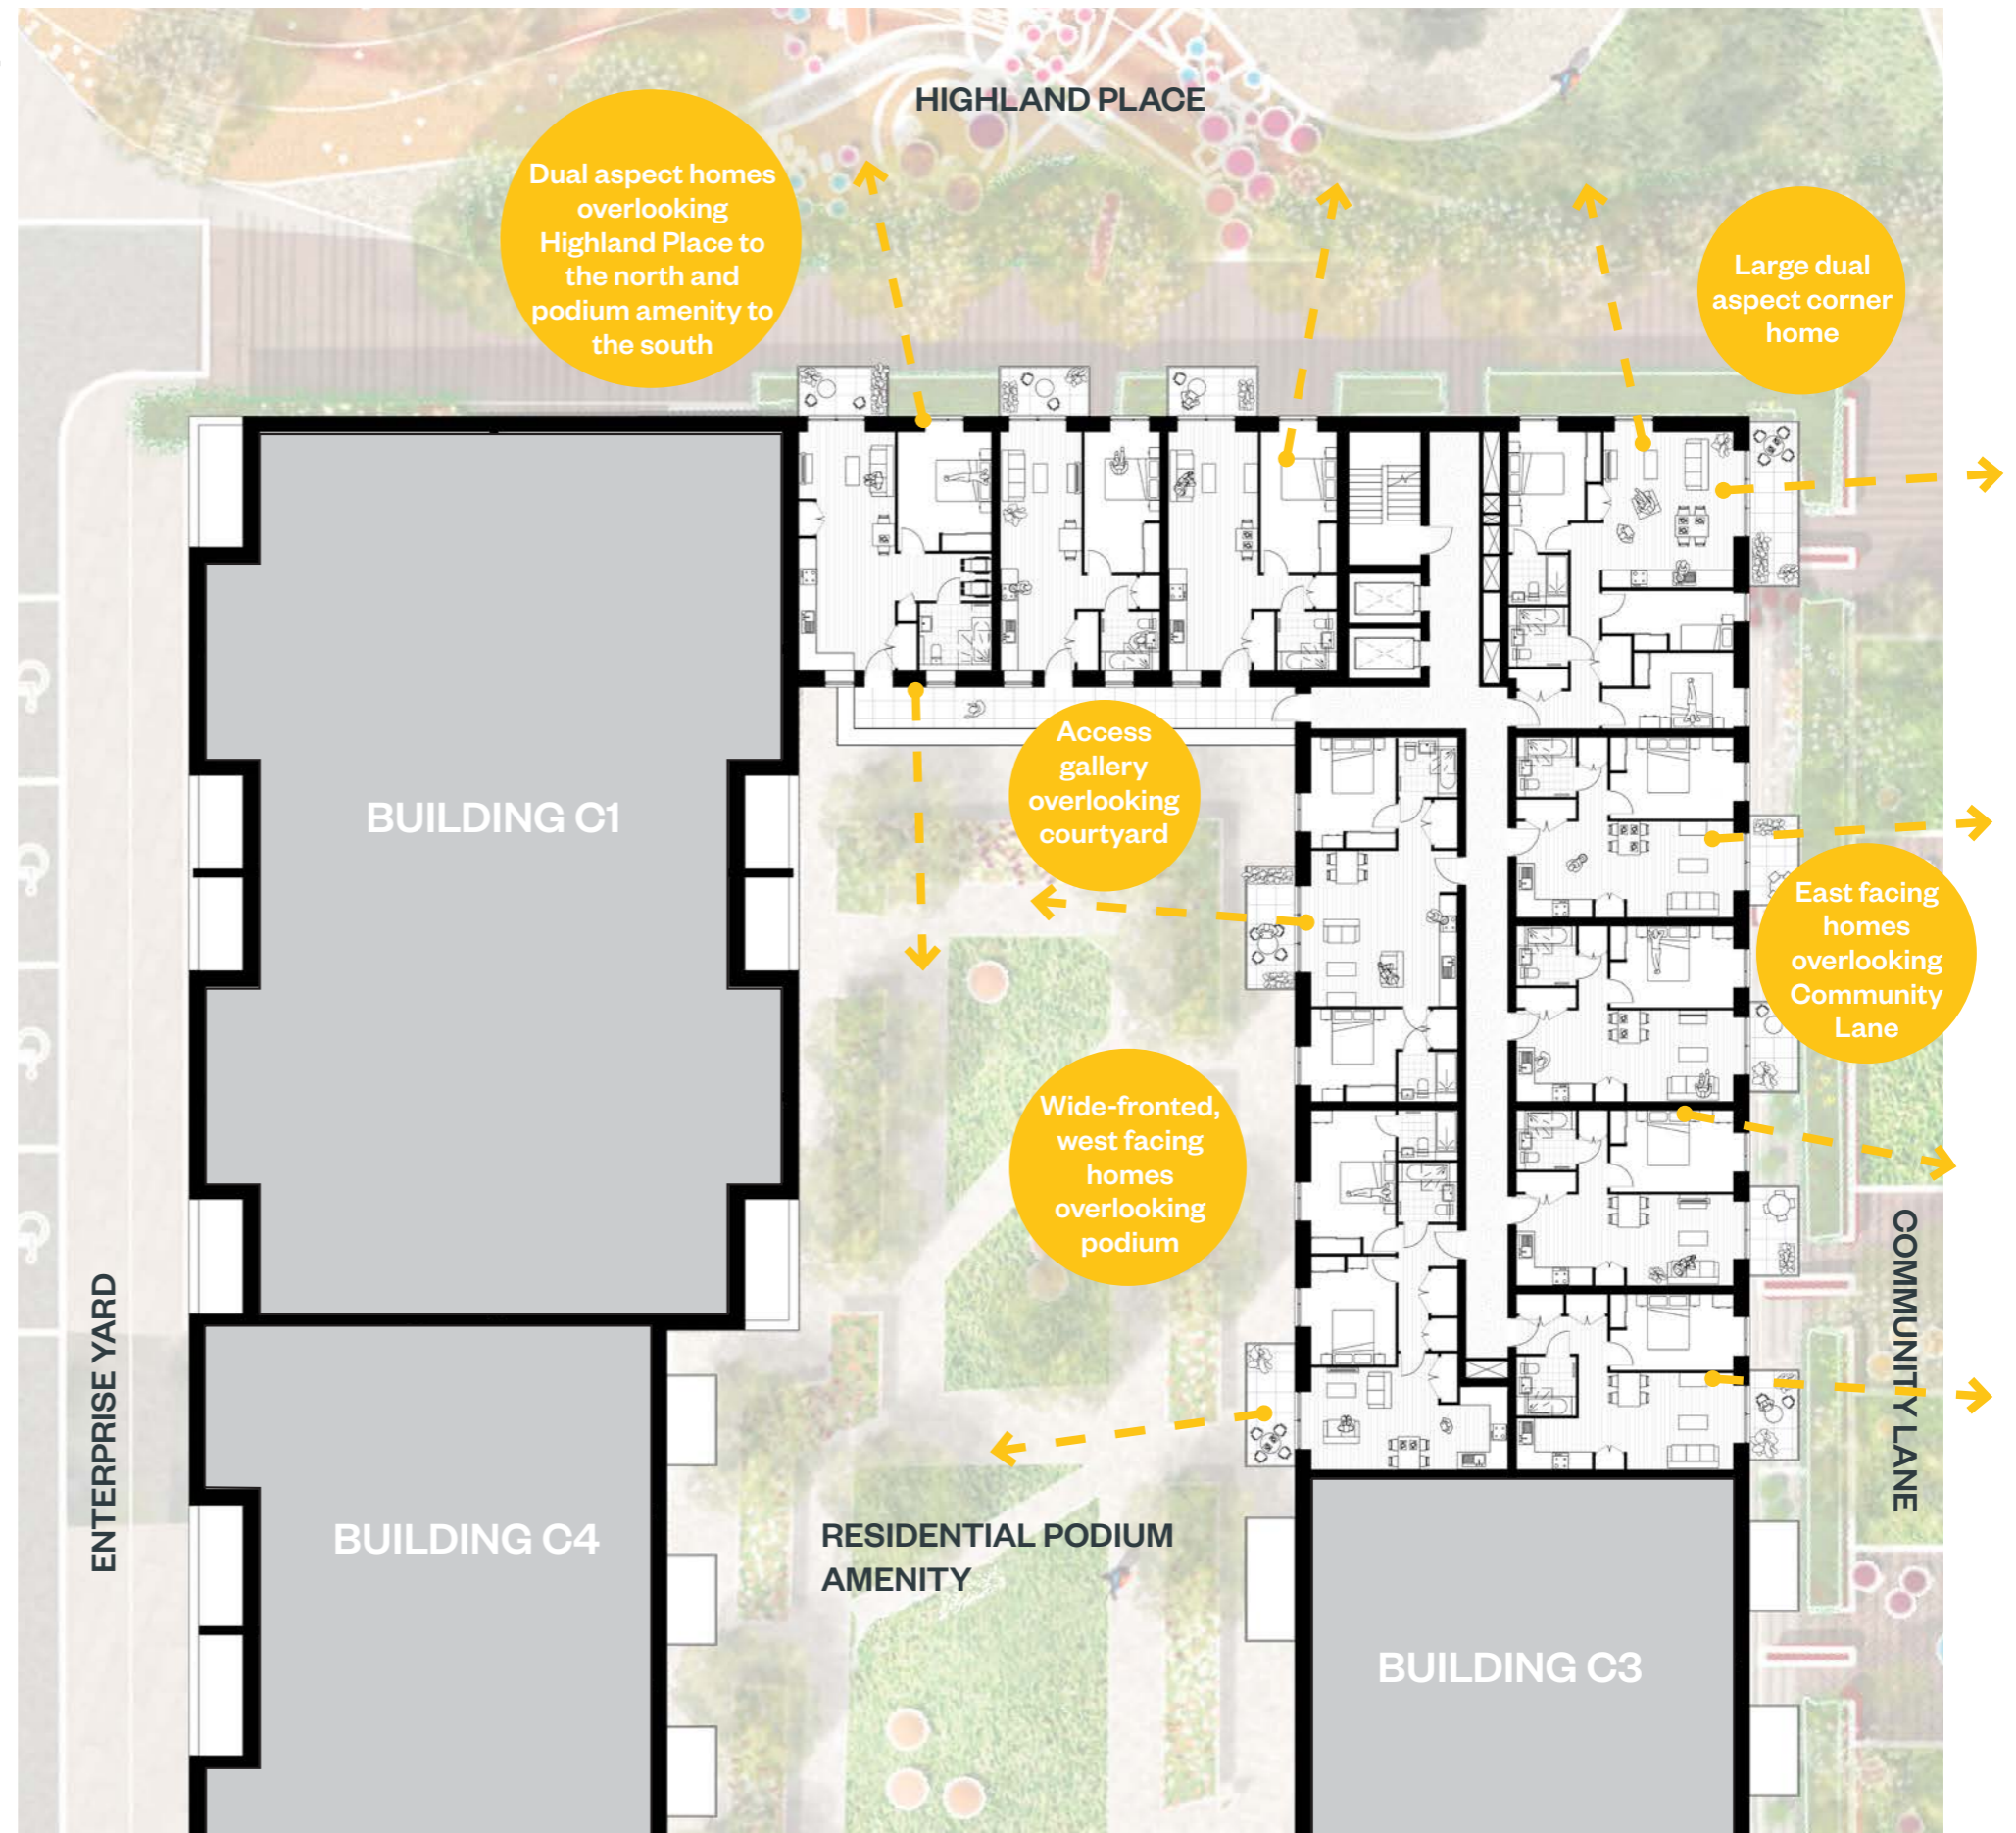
Typical upper floor plan of Building C2 illustrating building organisation and the internal plan of each home
